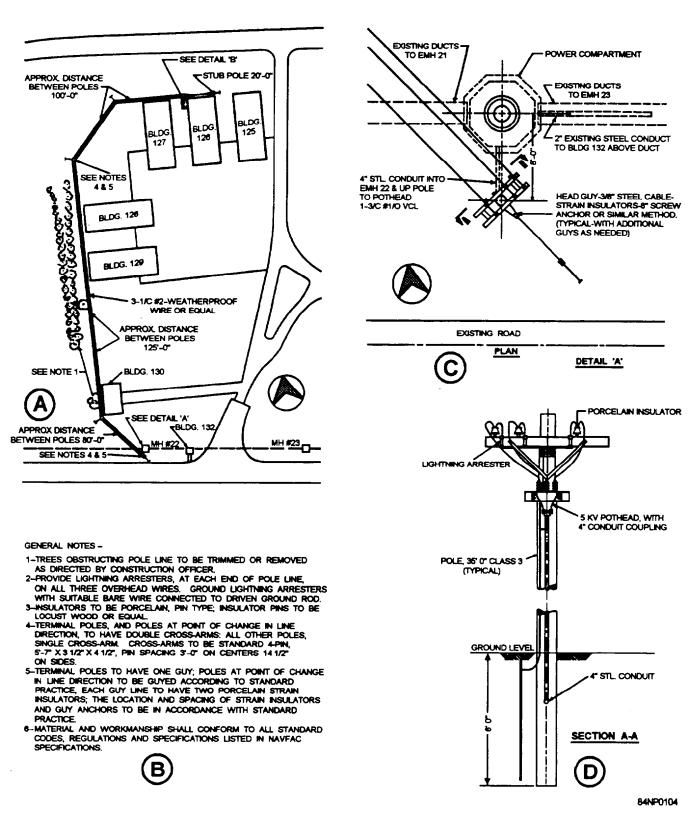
Plot plan with electrical layout, general notes, detail, and section drawings.
